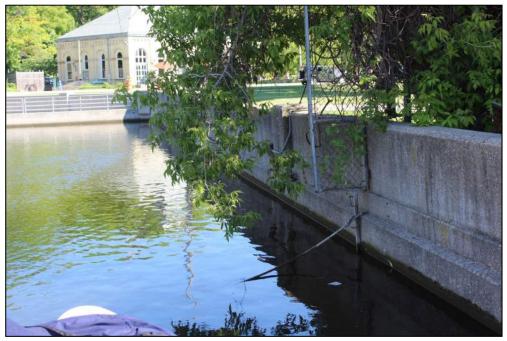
View of the most northern portion of the east channel wall with concrete pile cap and rail, facing north.
